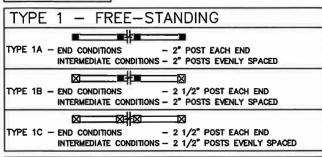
ontinued: ACCEPTABLE GUARDRAIL MOUNTING CONFIGURATIONS
